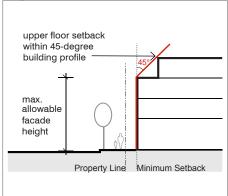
45-Degree Building Profile set at Minimum Setback Line
